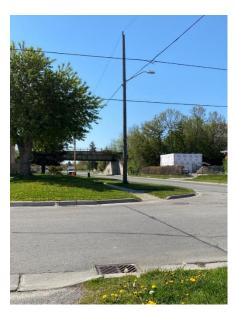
View of study area, showing disturbance (roadway, utilities, sidewalk), facing South.
